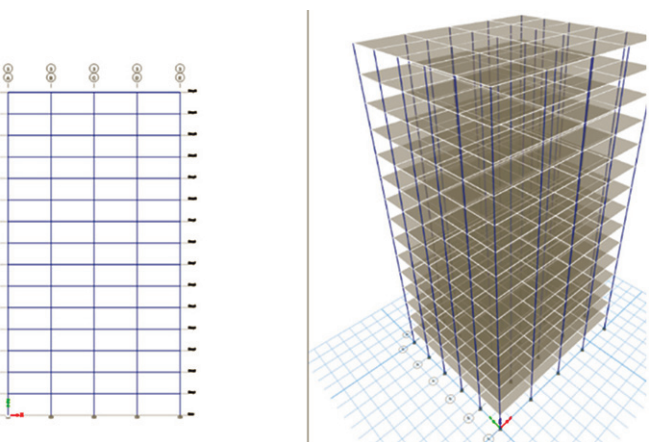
Views of the Mass Irregular-1 Model in elevation and 3D for both composite and RC buildings
